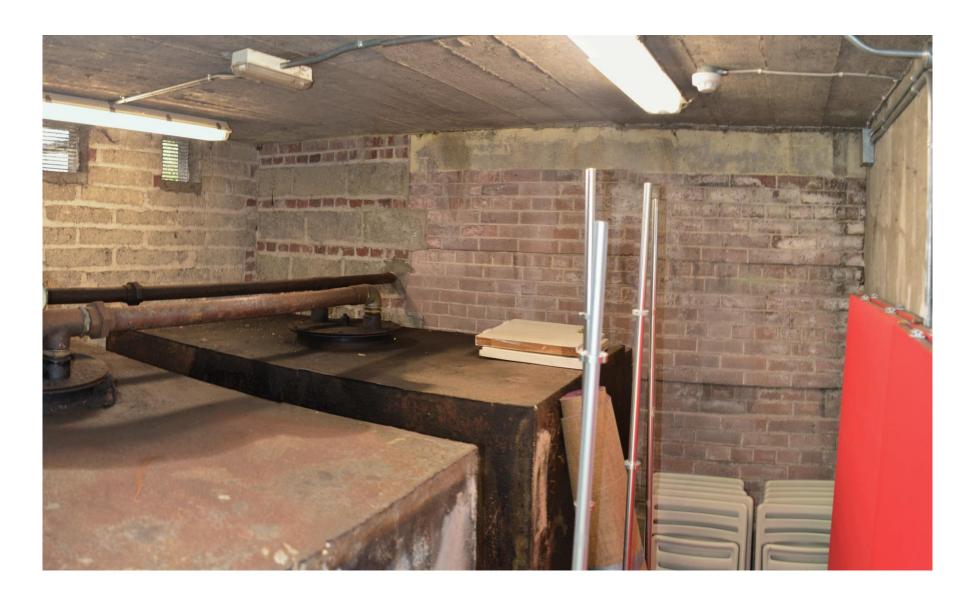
External plant room adjacent to internal boiler room. Accessed from rear garden/ refer above.
